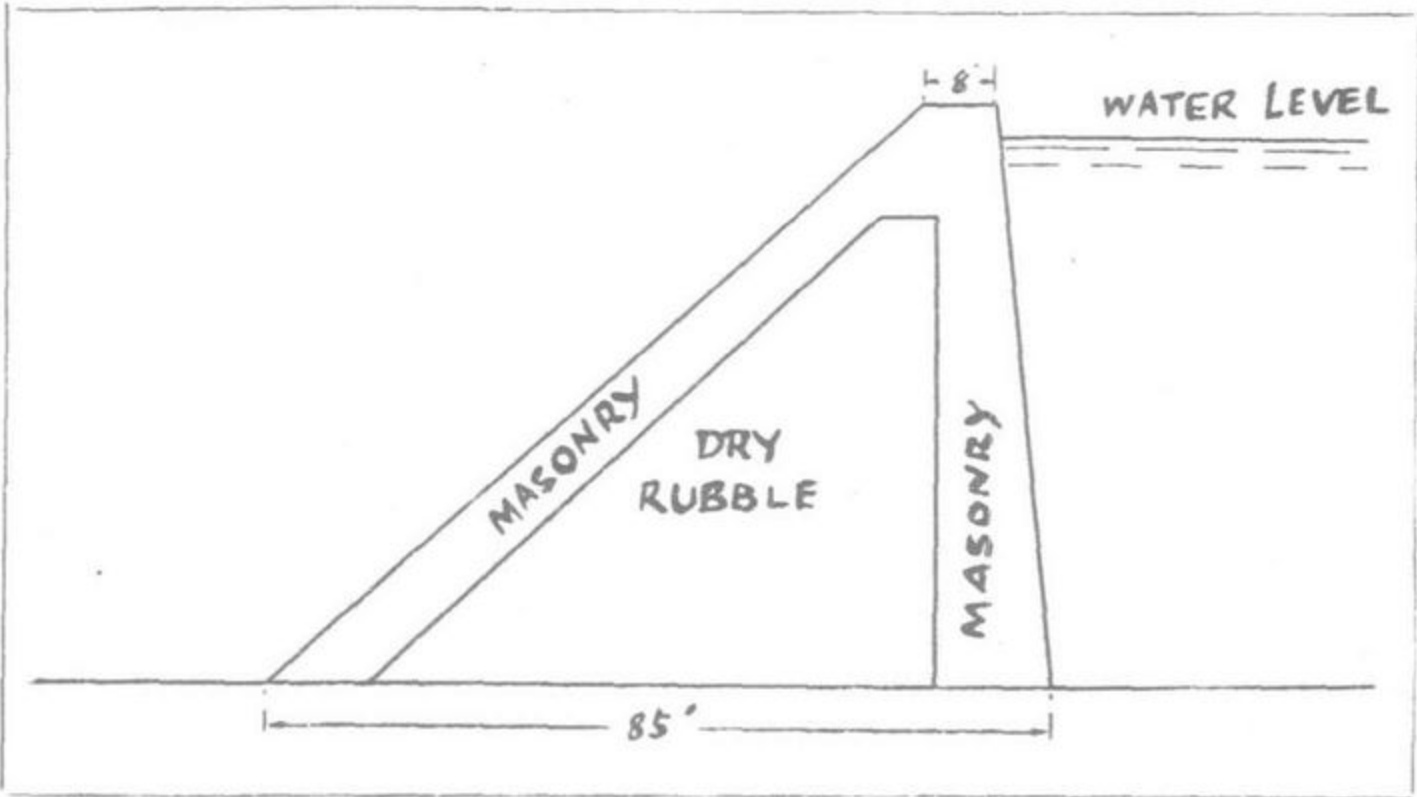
Castlewood Reservoir Dam, Colorado. This type of dam is not popular. The "Walnut Grove" Dam, 110 feet high, which collapsed in 1890 was of this type
